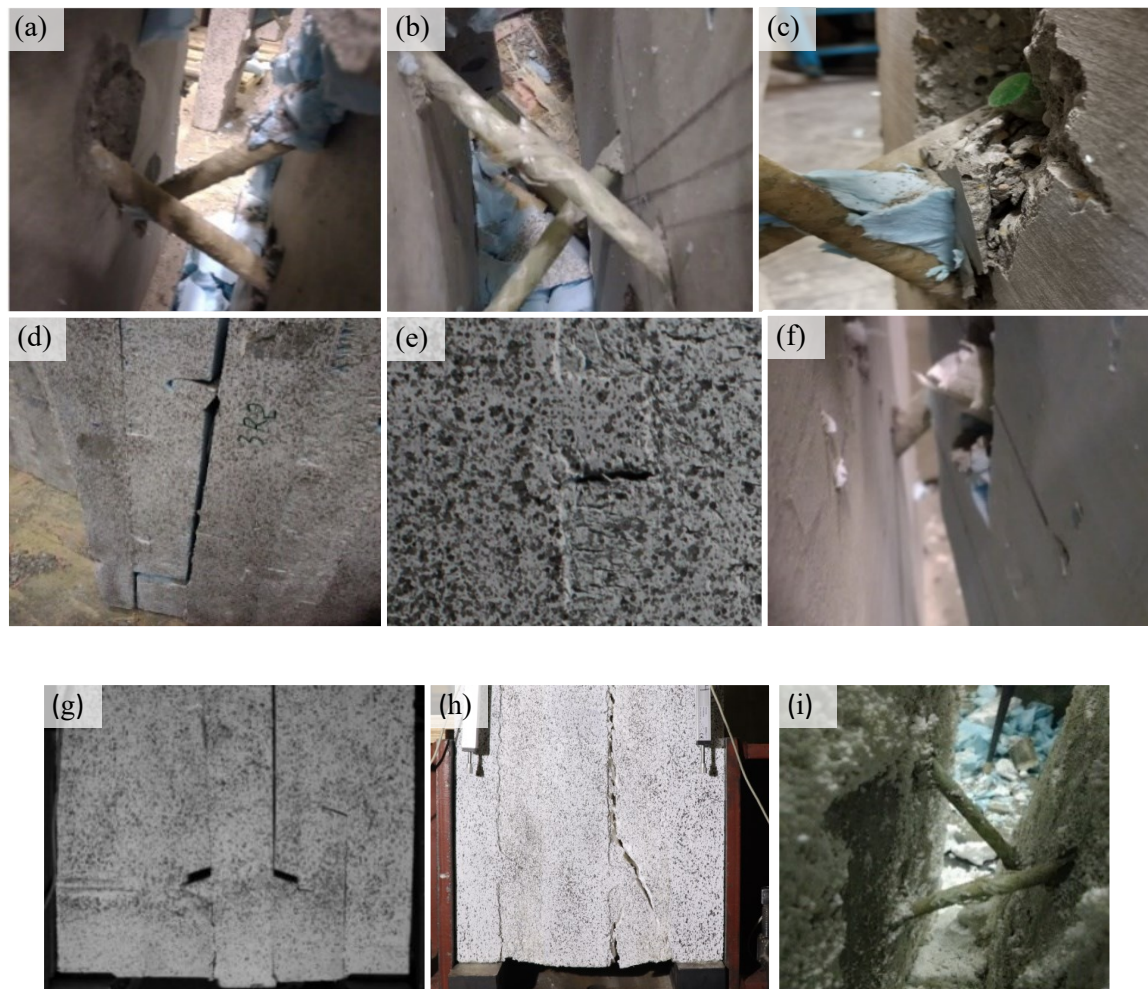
Post-test investigation (a) connector pull-out (b) compression failure of connector (c) Blow-out of concrete around the connector (d) breaking of notches and tensile failure of insulation at rectangular notch interface © crushing of insulation bearing against notches (f) connector rupture (g) insulation bearing failure and prying around trapezoidal notch (h) diagonal splitting of insulation (i) EPS bonded to concrete.
